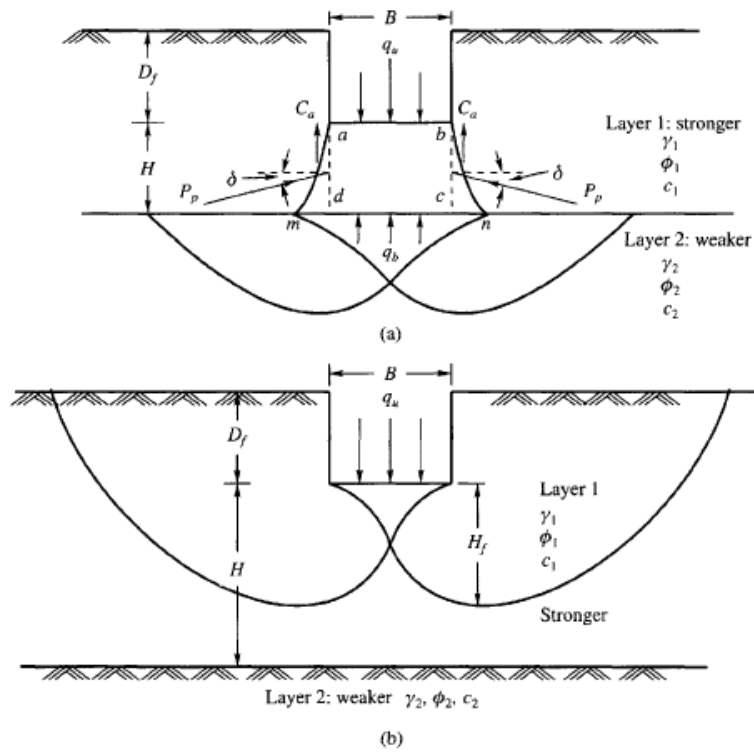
Failure of soil below strip footing under vertical load on strong layer overlying weak deposit (after Meyerhof and Hanna, 1978)
